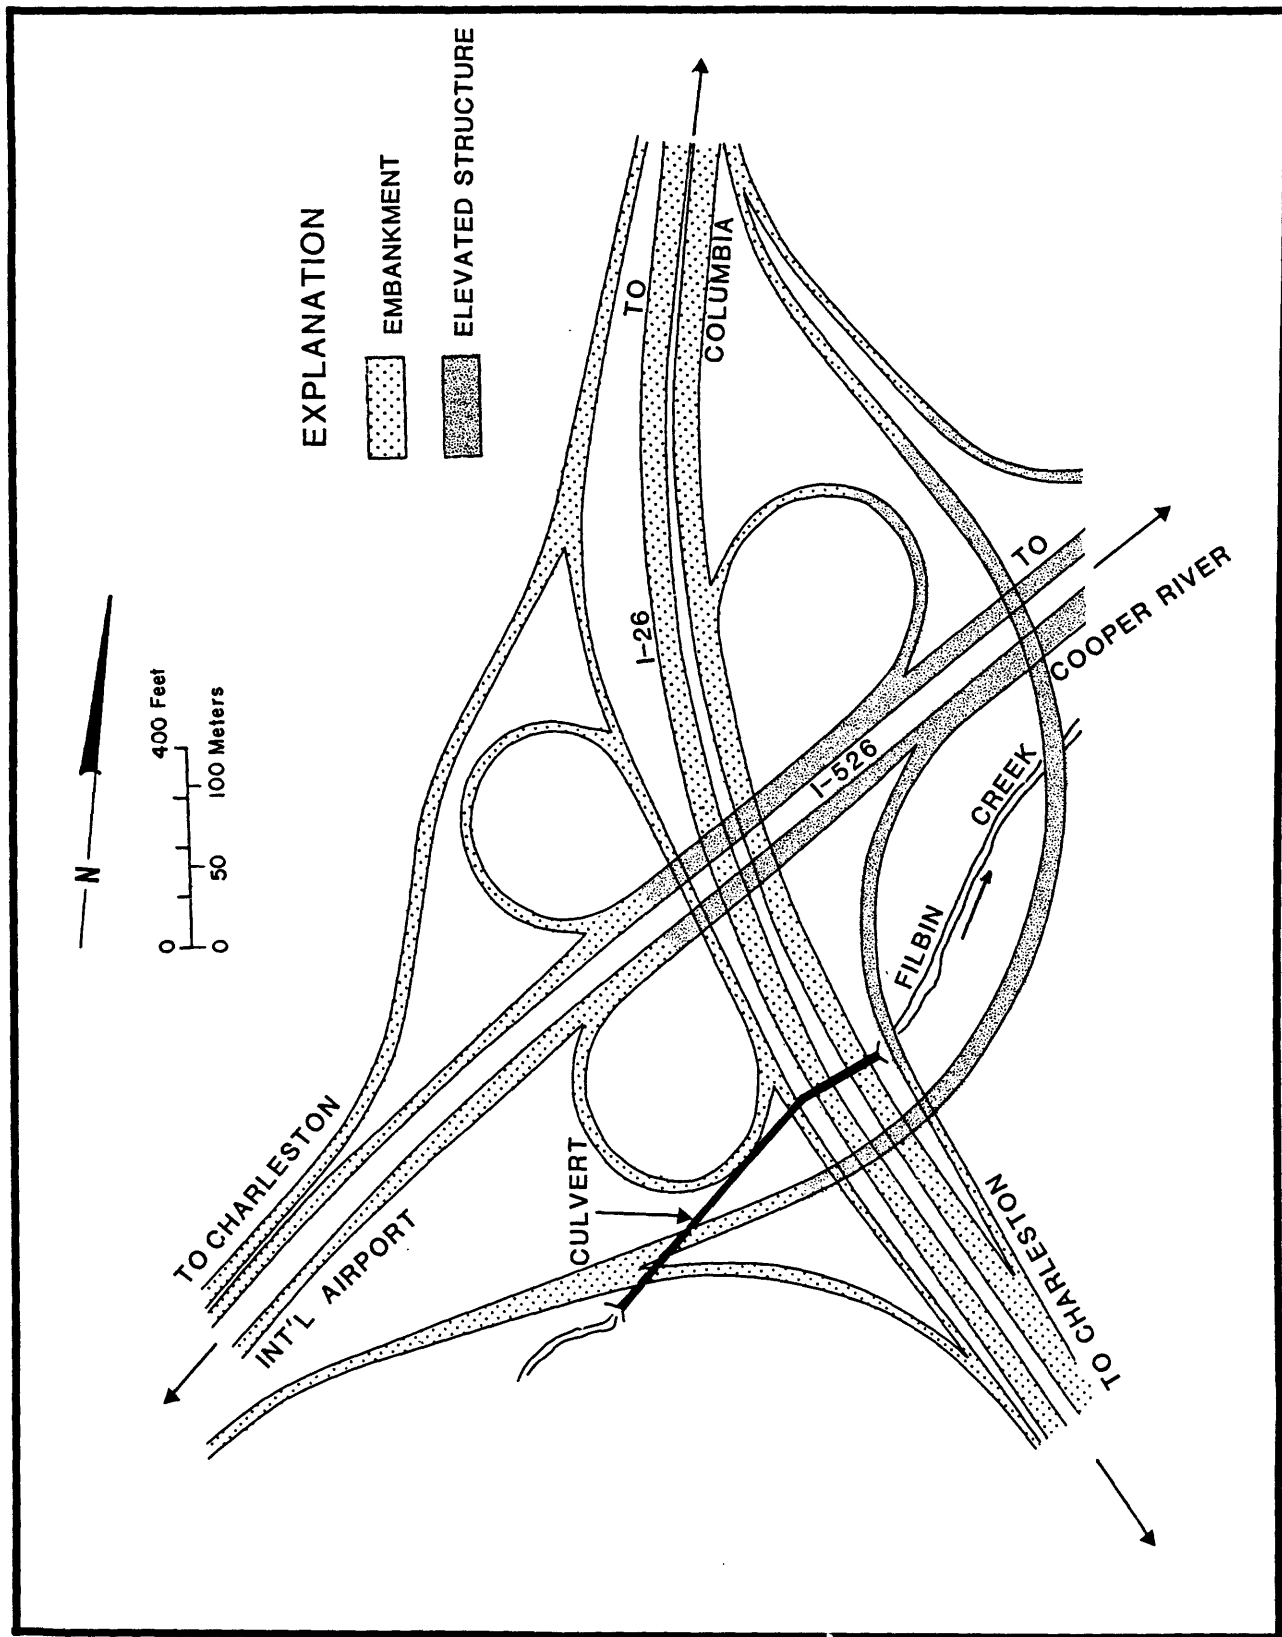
Filbin Creek at proposed I-26/I-526 interchange, construction alternative A.
